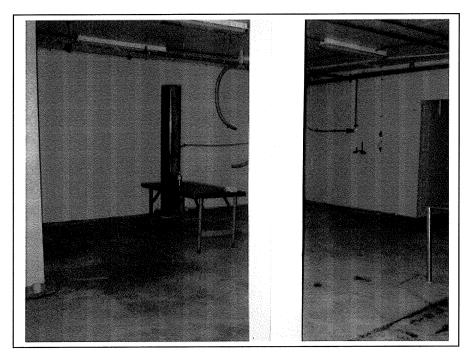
The Egg Room in the Crab Plant. (September 12, 2014)
